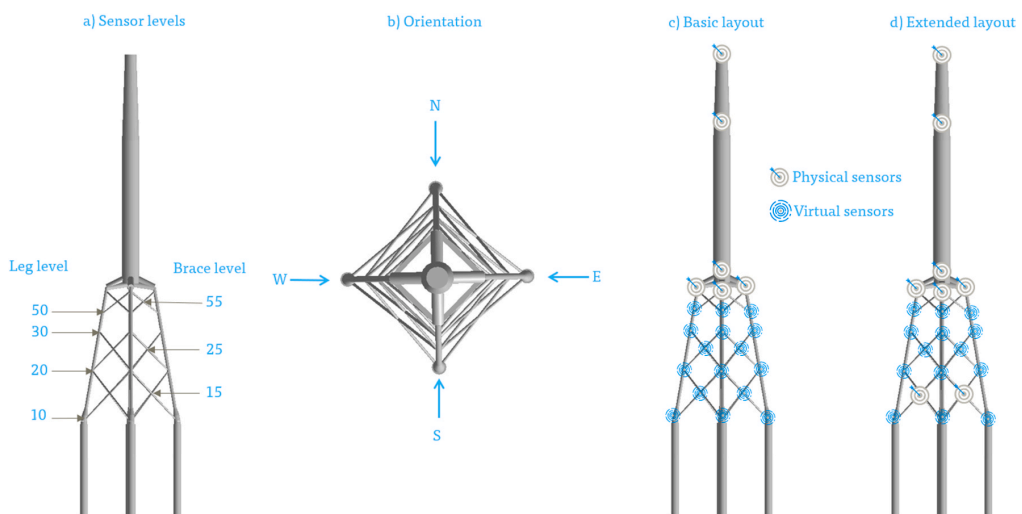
Instrumentation of the jacket substructure. a) sensor levels, b) substructure direction, c) basic sensor layout, and d) extended sensor layout.
